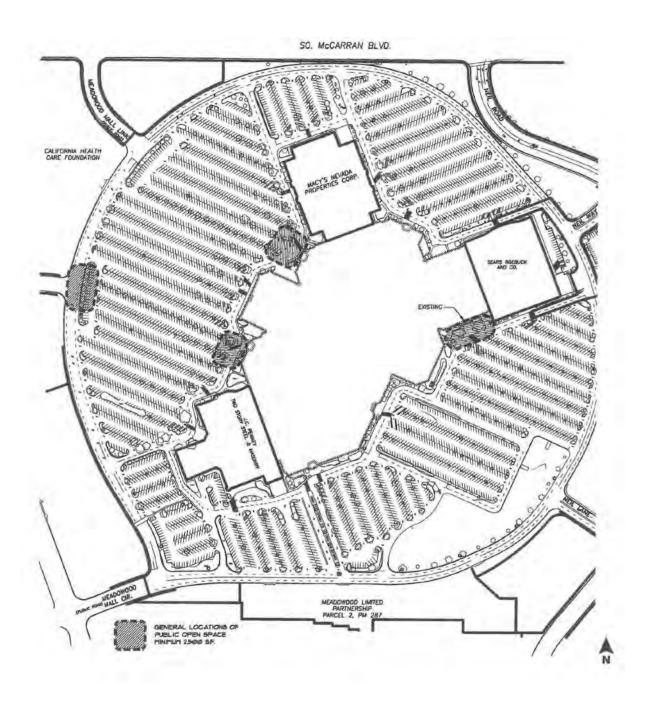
GENERAL LOCATION OF PUBLIC OPEN SPACE
